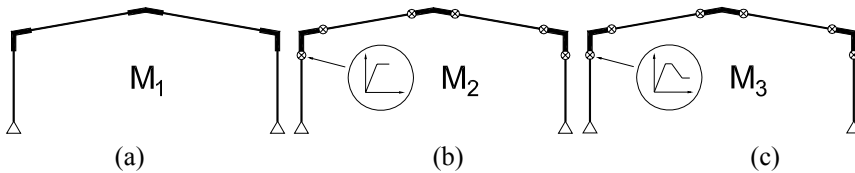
Considered structural models: rigid connections - M1 (a), elastic-perfectly plastic connections - M2 (b), and degrading connections – M3 (c)
